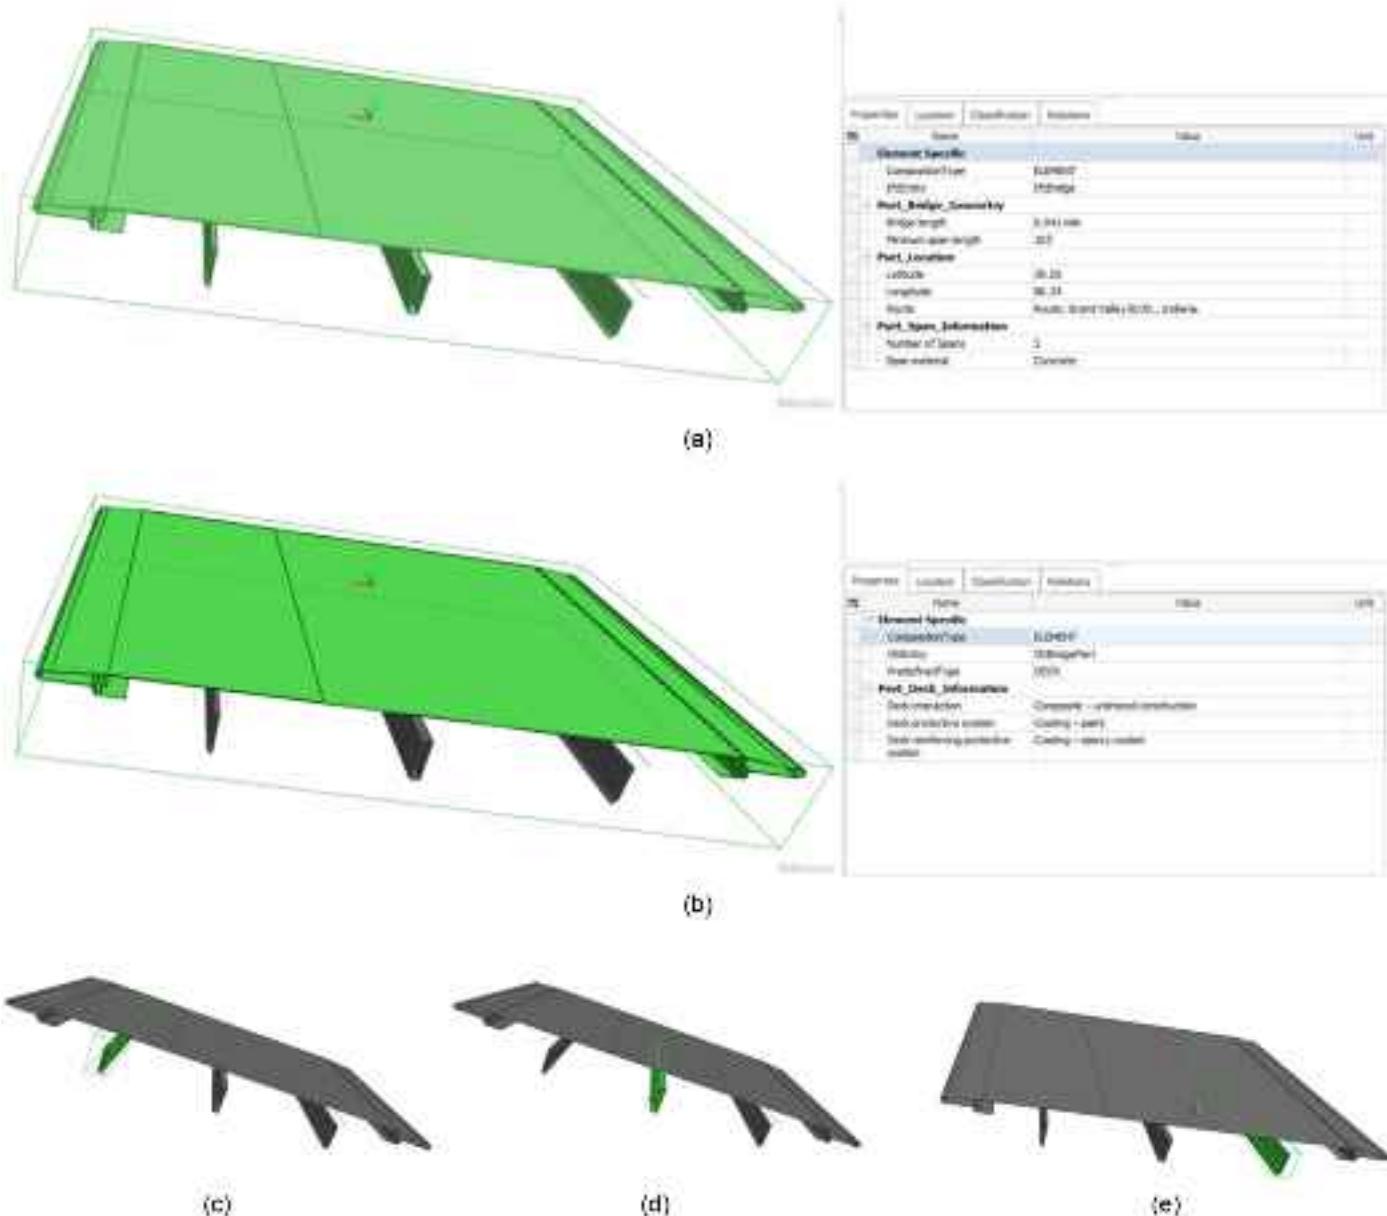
An example of a semantically segmented and enriched IFC bridge model: (a) bridge; (b) deck; (c) Pier 1; (d) Pier 2; and (e) Pier 3.
